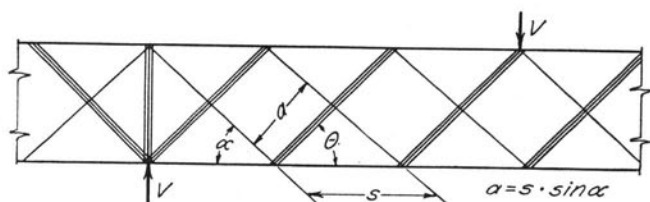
TRUSS WITH INCLINED TENSION AND COMPRESSION WEB MEMBERS
